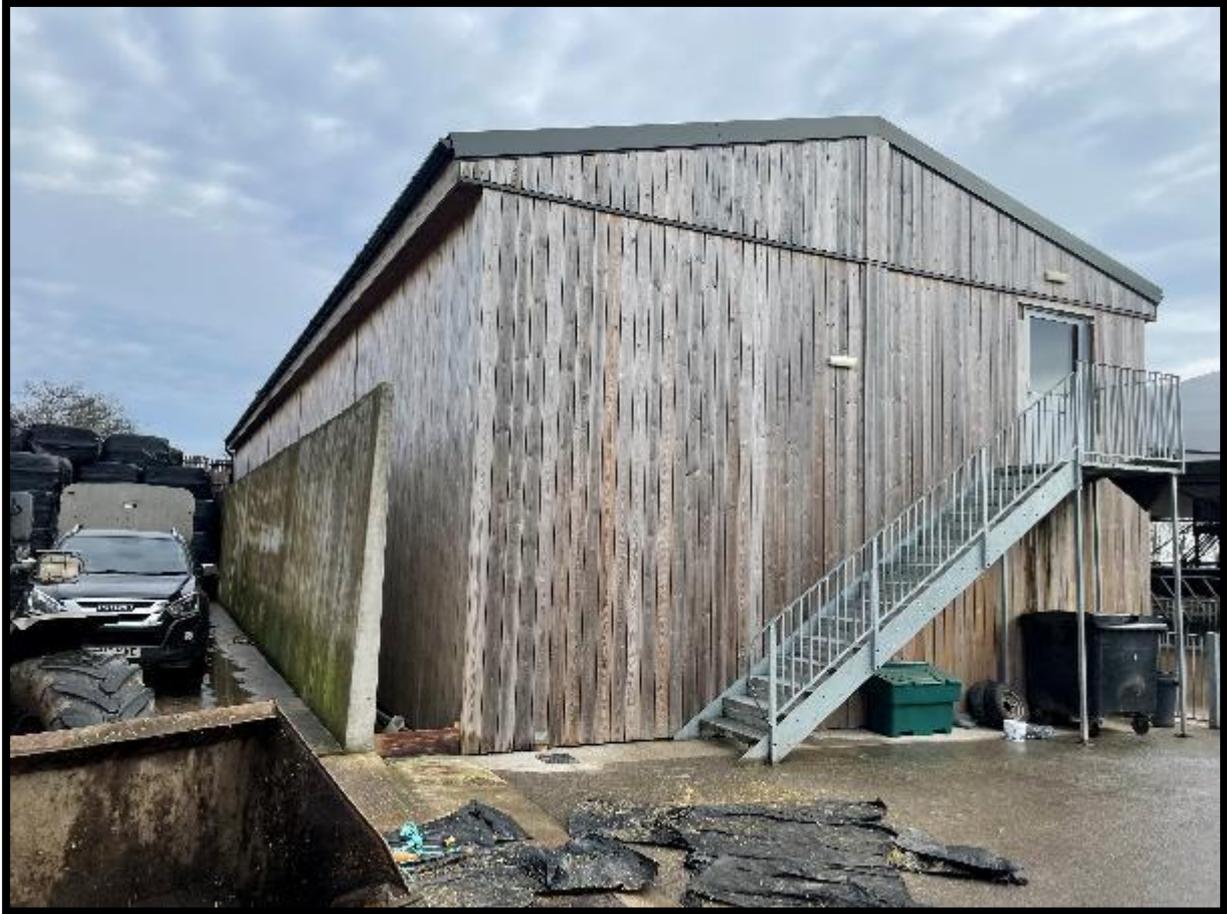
Concrete clamp wall on eastern side to be removed as part of the scheme to enable the two buildings to be connected at first floor level.
